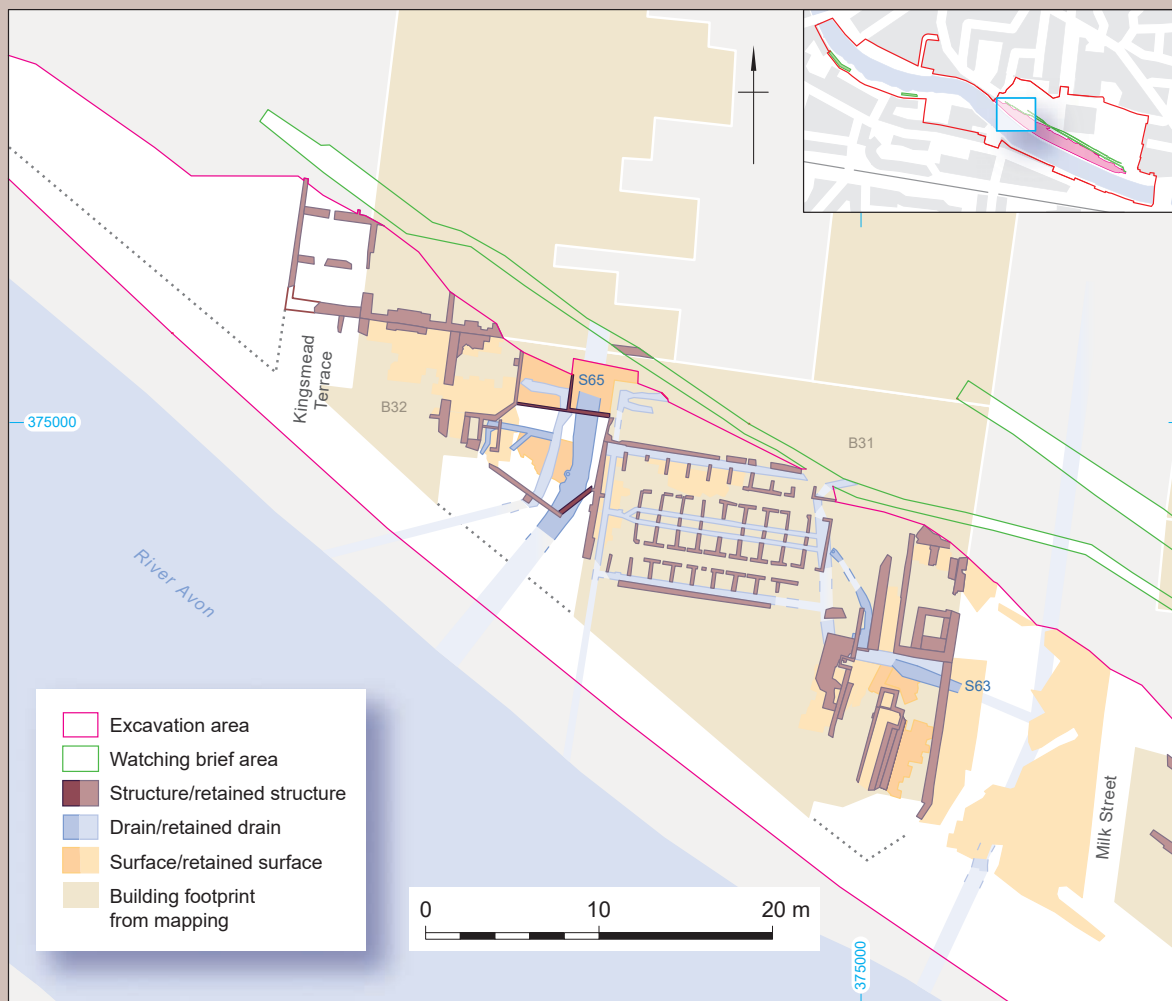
Plan showing the development of the Milk Street Baths, 1874–1930. Building outlines based on 1885 OS Town Plan
